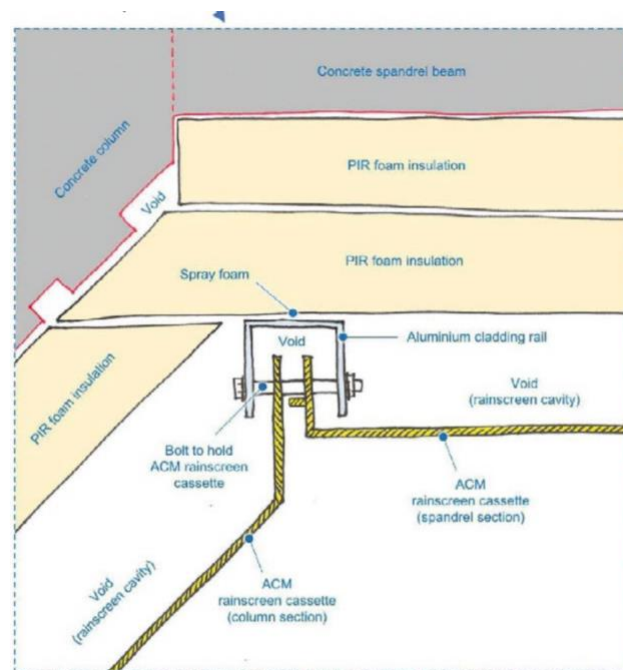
A cross-diagram showing insulation and ACP installation on Grenfell Tower
